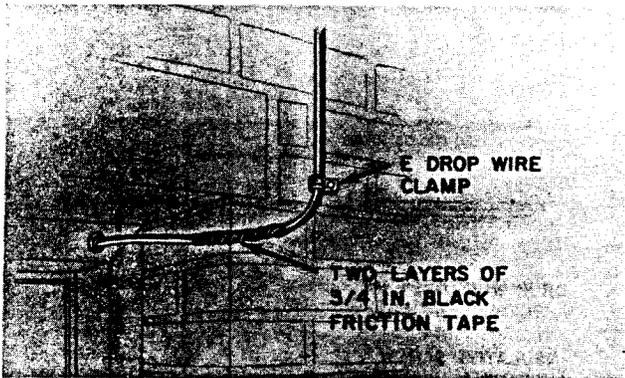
Last Attachment, Building Entrance Slopes Upward From Outside
